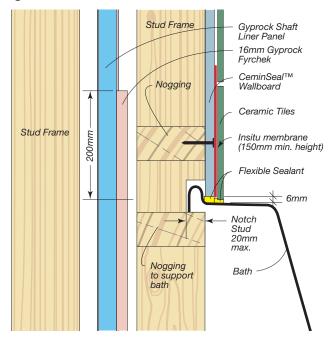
Alternative Tub/Basin install (Discontinuous linings) - Elevation
